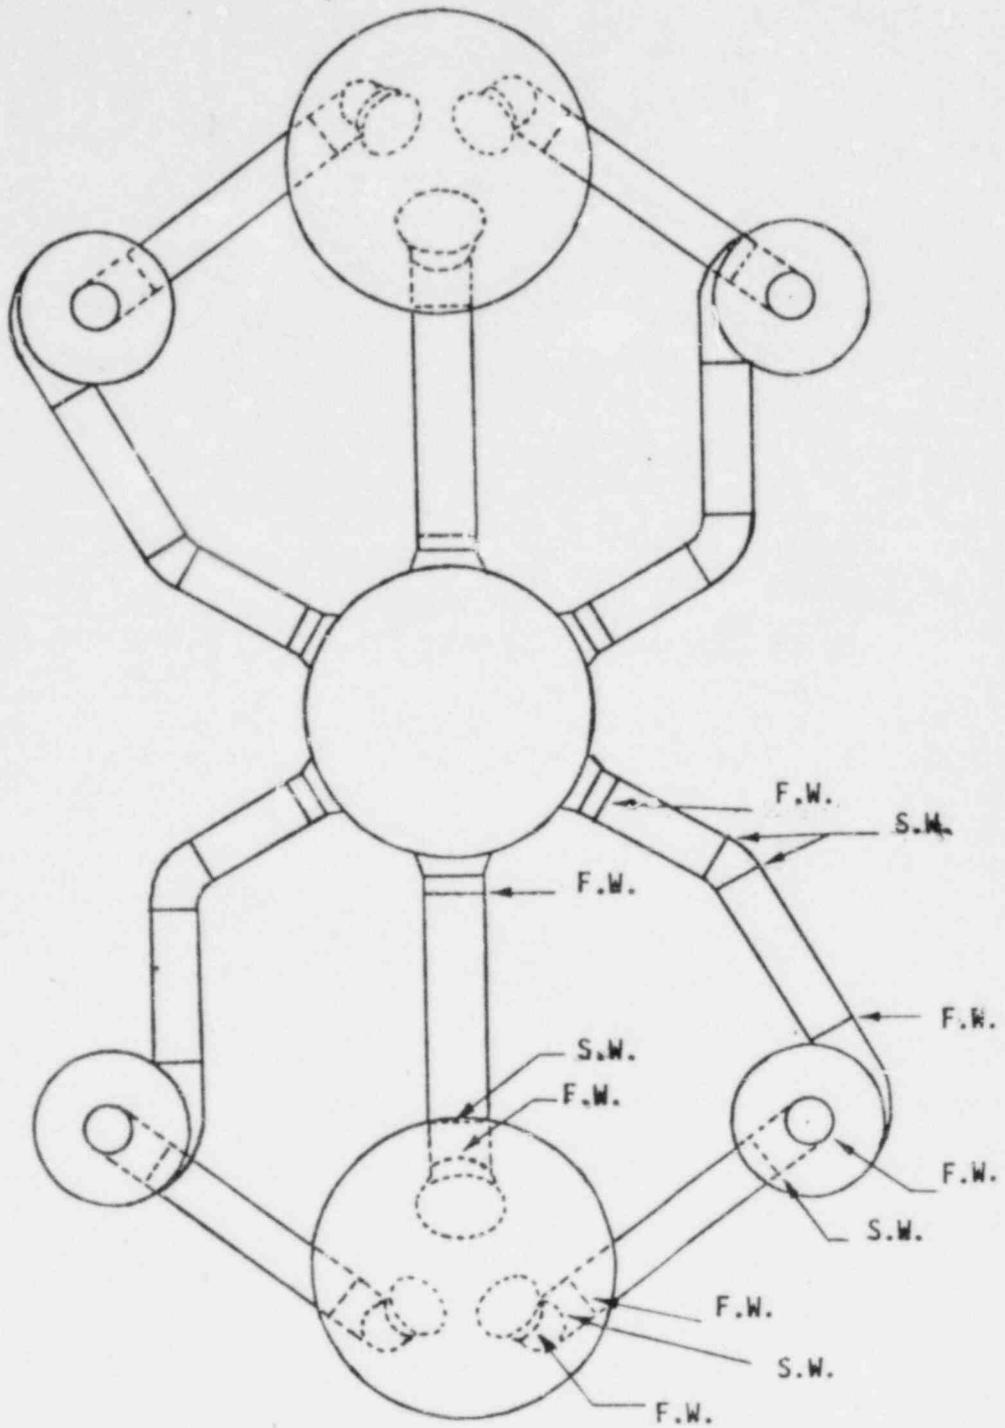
Weld location for Fort Calhoun Unit 1
